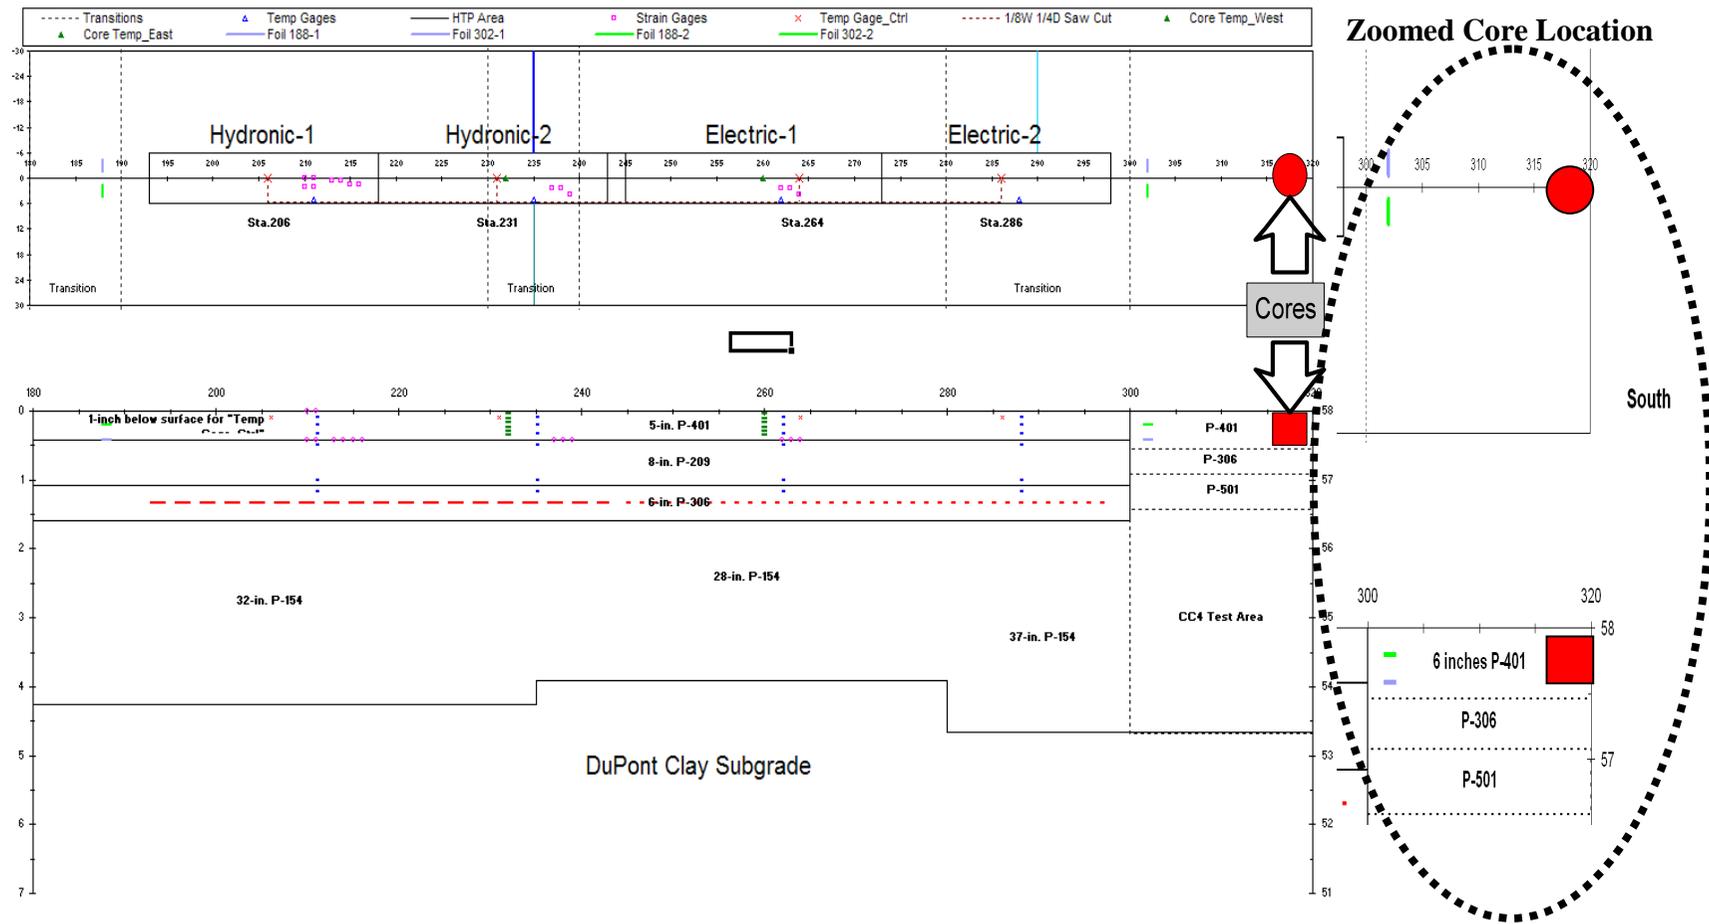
Pavement Cross Section and Core Location in High Tire Pressure Testing Area at the NAPTF.
